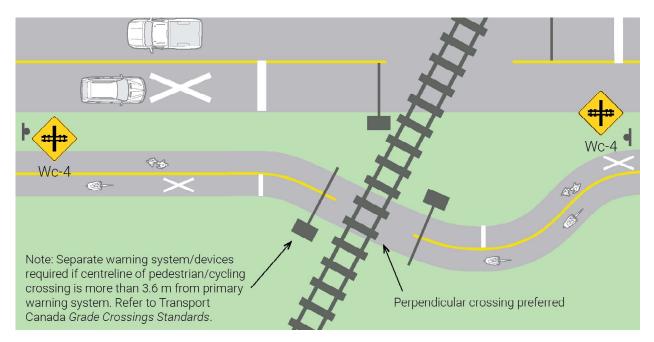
Rail Crossing with Jug Handle, In-Boulevard Multi-use Path
